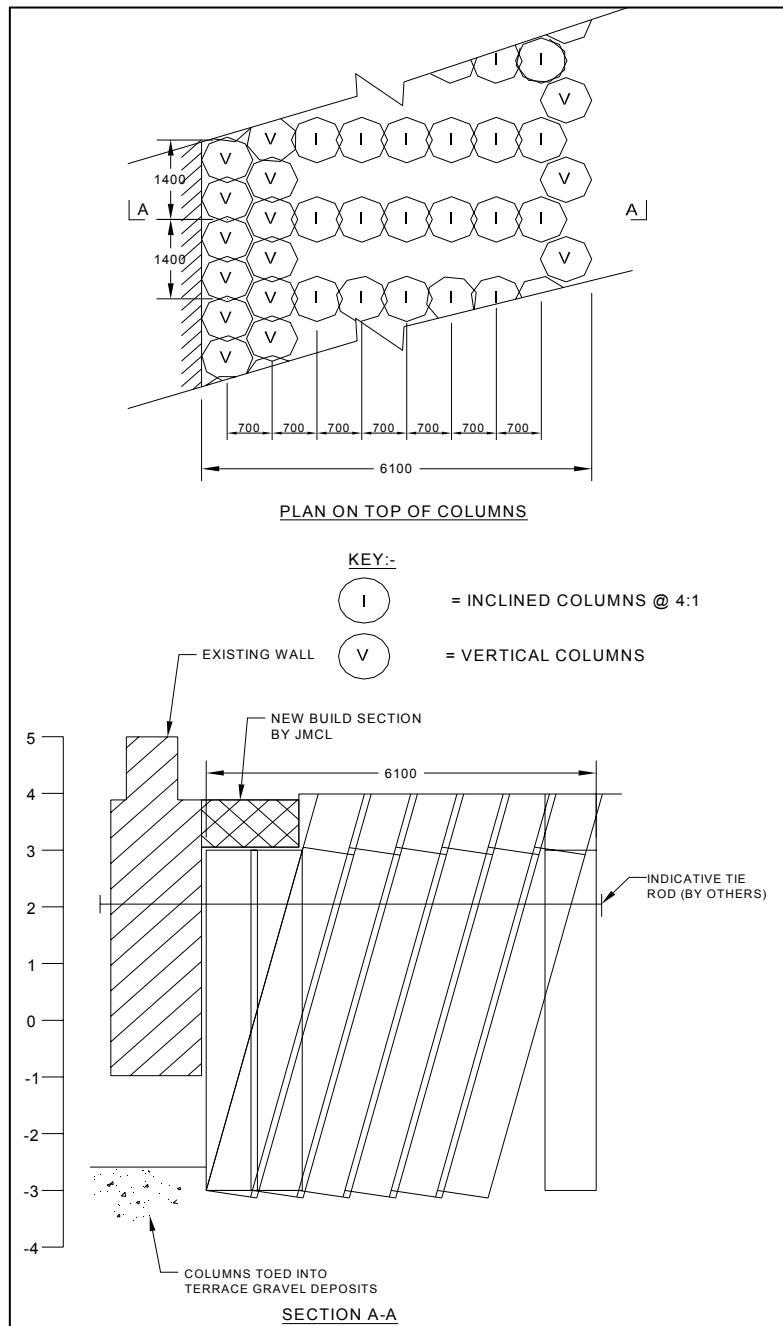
Plan and section drawing for columns installed to support a mass gravity wall at Barking, United Kingdom.
